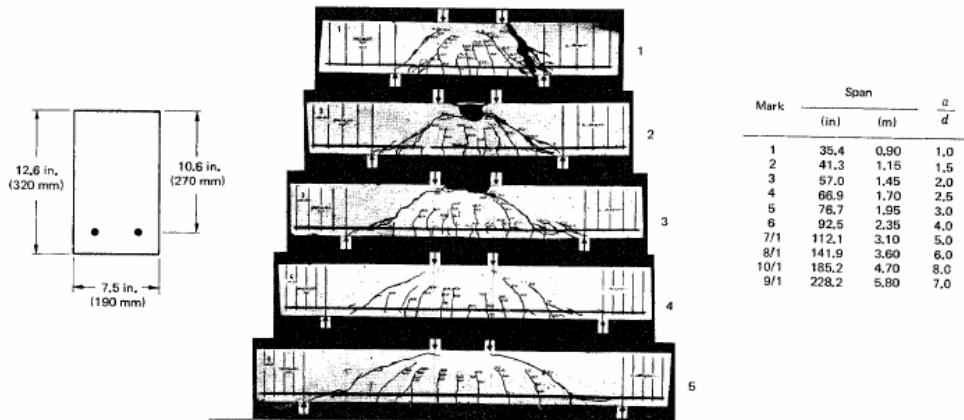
Crack patterns in beams tested by Leonhardt and Walther (Park & Paulay, 1975)
